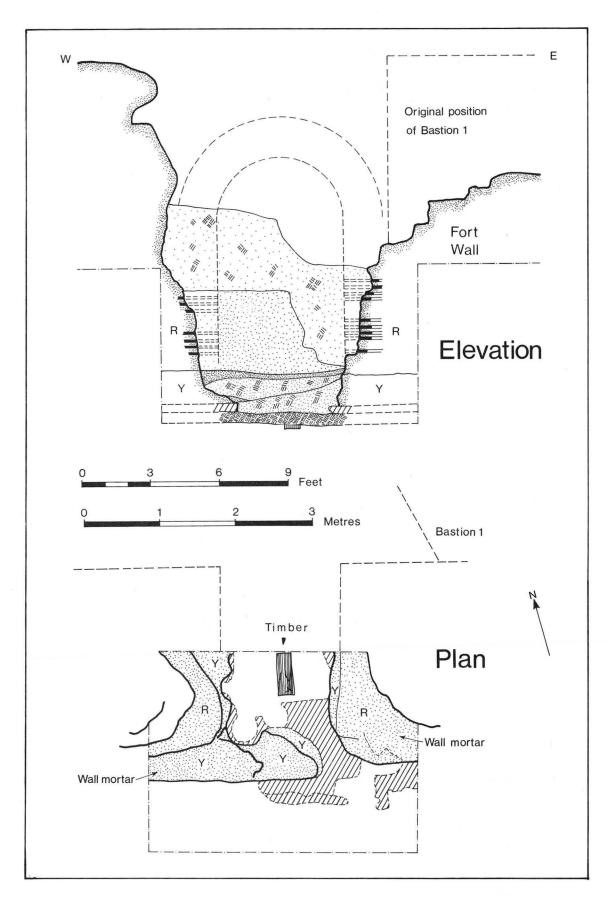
Postern gate (Area L1): plan of excavated area and suggested internal elevation of gate passage. Scale 1:50.
